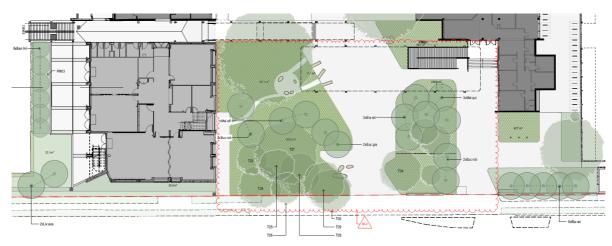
Modified CAPA/ Building A Entry/ Landscape
